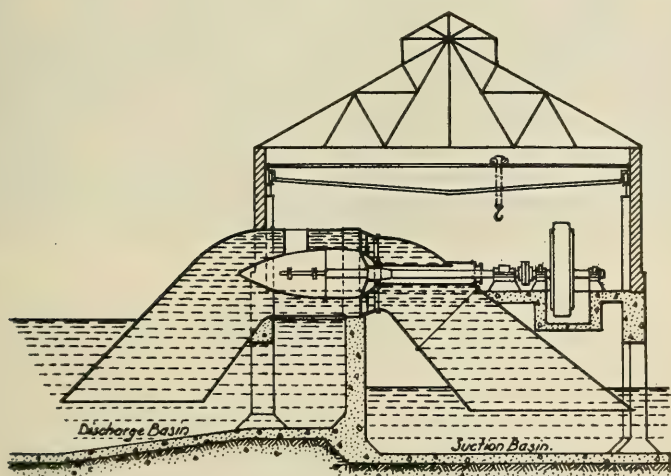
Section through 12-foot screw pump, New Orleans drainage pumping plant.
